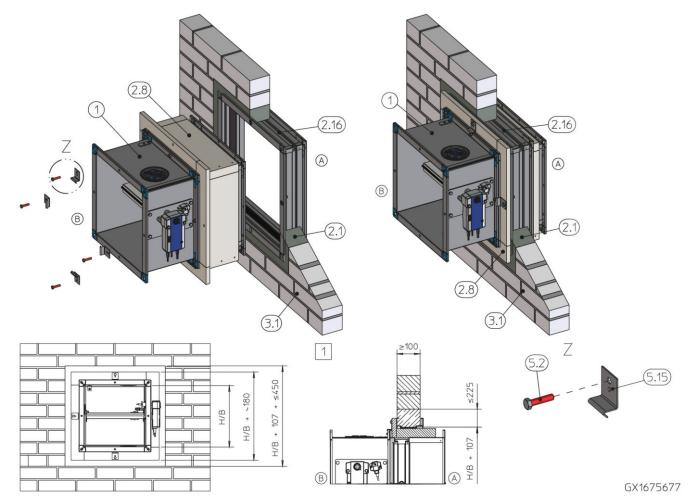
Dry mortarless installation into a solid wall, with installation subframe and installation kit E1 or E2
